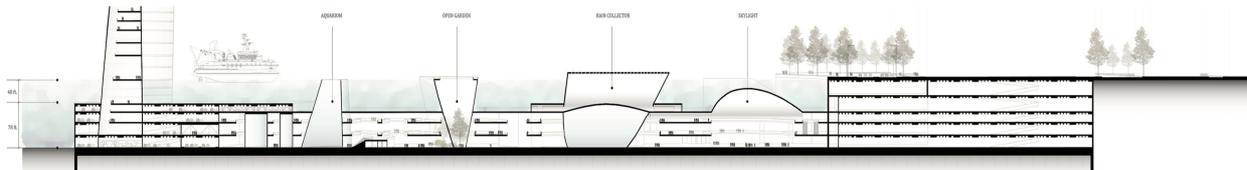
Longitudinal Section of the Proposed Construction Process, Horizontal Massive
